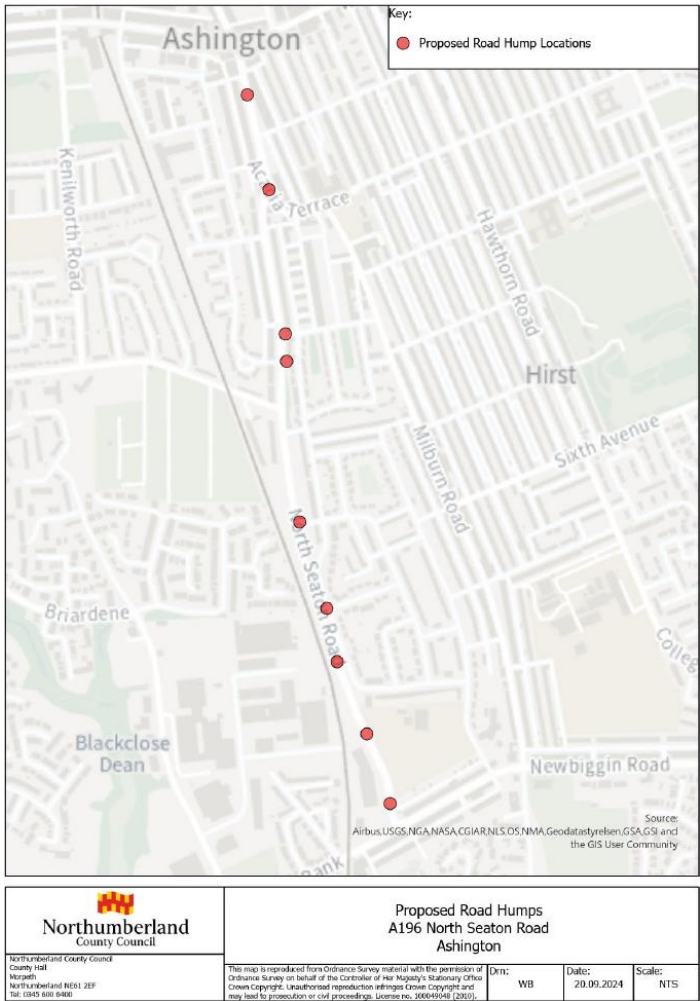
Proposed road humps at the A196 North Seaton Road and its adjoining roads
